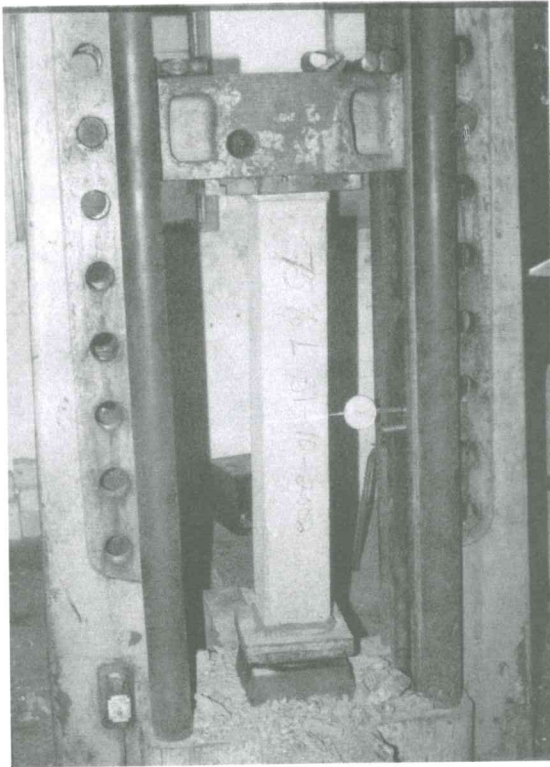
Bamboo-Reinforced Laterised Column under Loading
